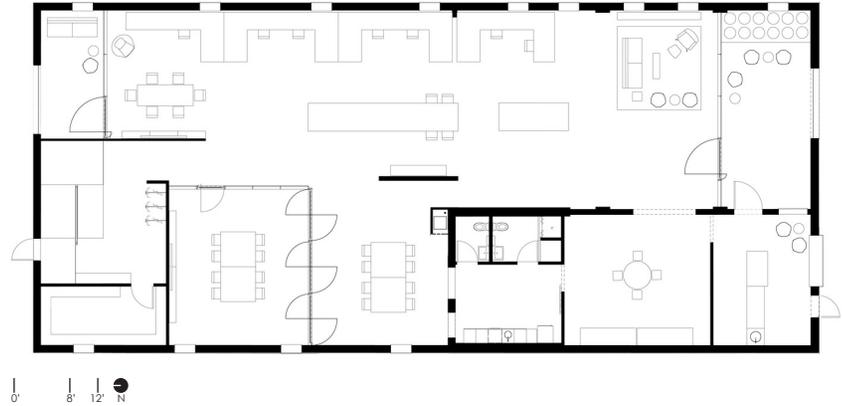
| *Studio 1334*, Floor Plan credited to [debartolo architects]
